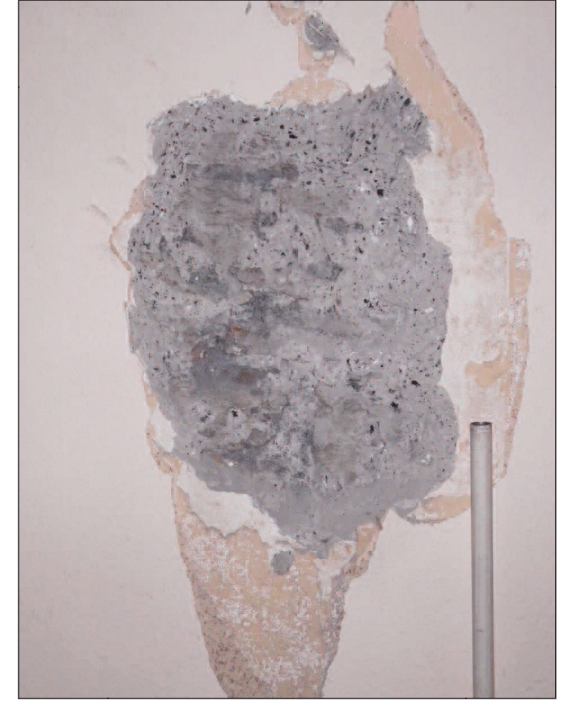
East sample patch of the south wall of the front east bedroom, looking south
